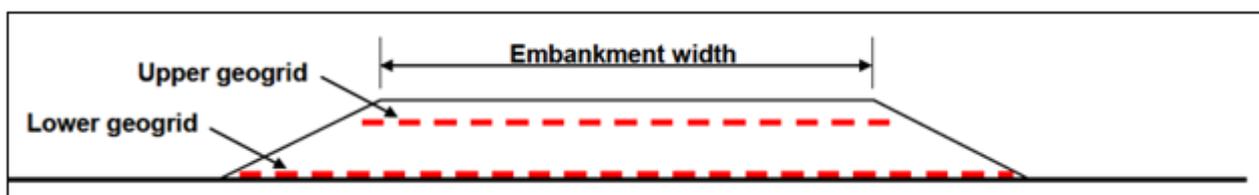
Typical Stabilised 'Floating Road' Cross Section with Geogrids
